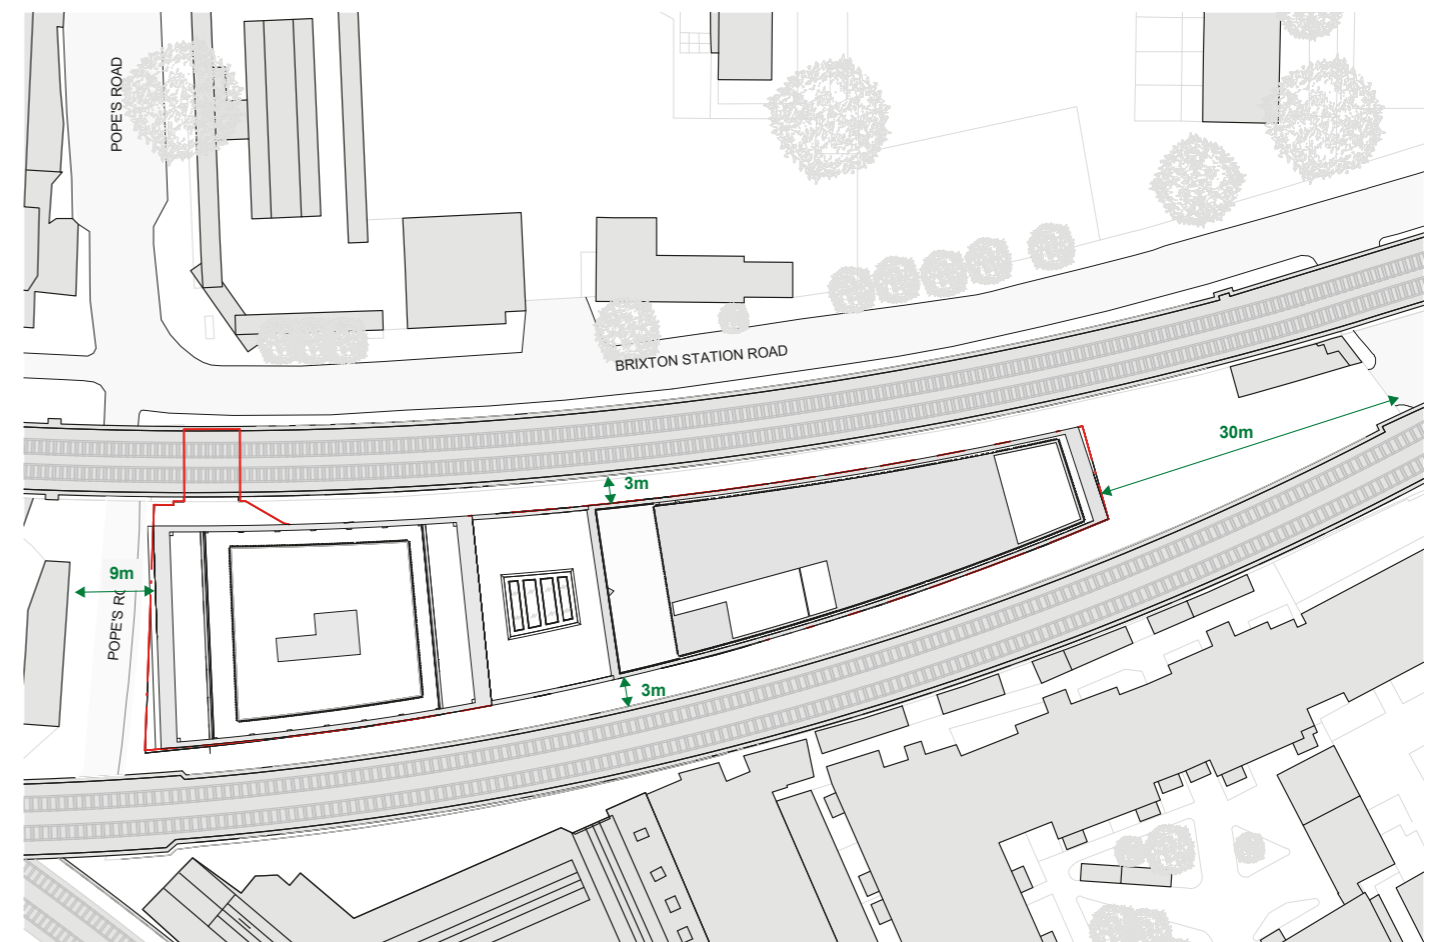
Proposed site plan with approximate distances to neighbouring structures
